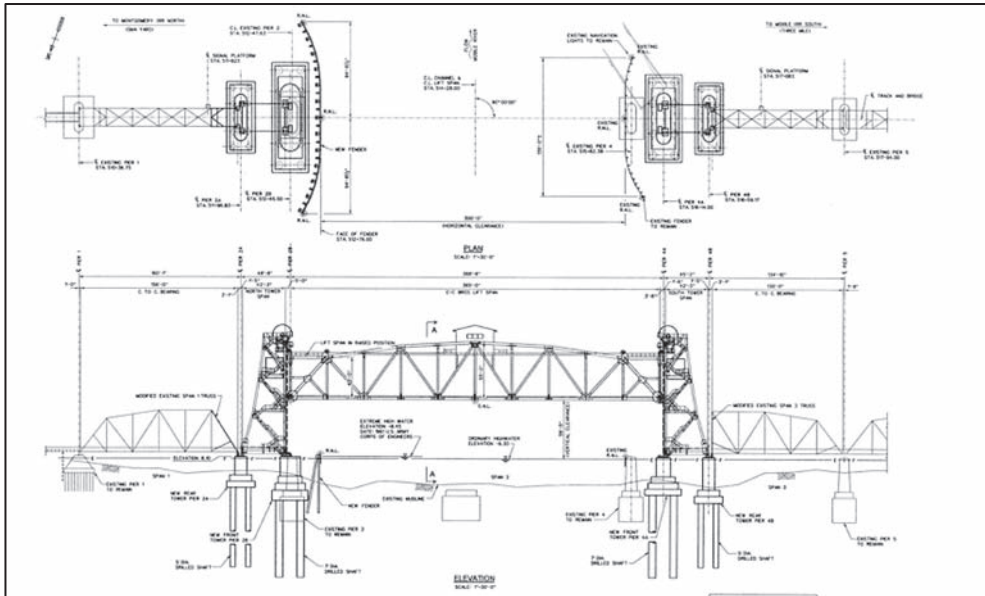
General plan and elevation of proposed replacement structure (CSX Plans, 2006).
